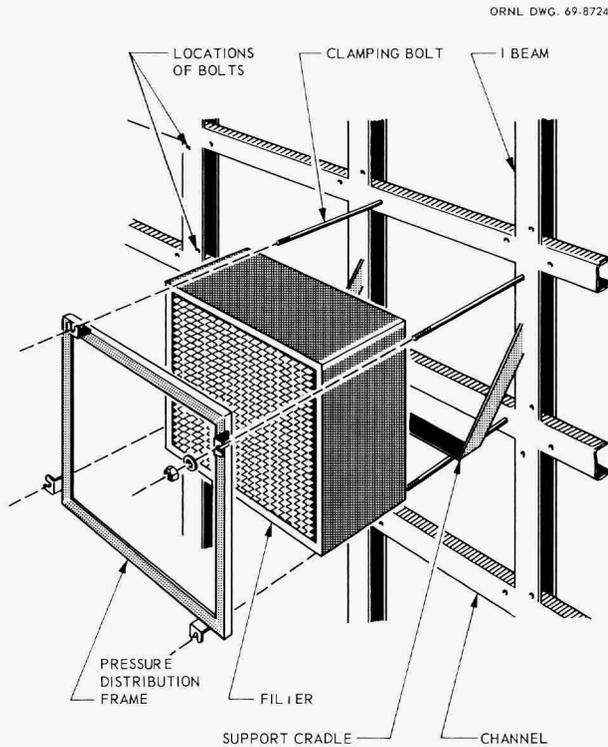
Filter installation (exploded view) illustrating an acceptable filter support and alignment cradle. See Fig. 4.6. Support and bolts shown for only one filter.
